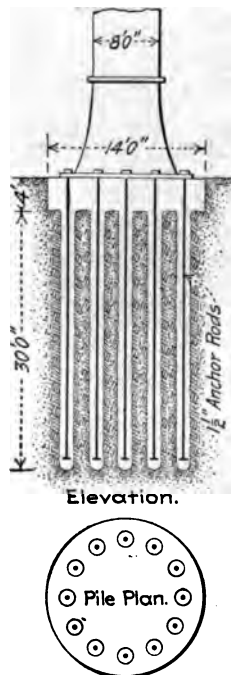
Chimney Foundation of Simplex Concrete Piles.
